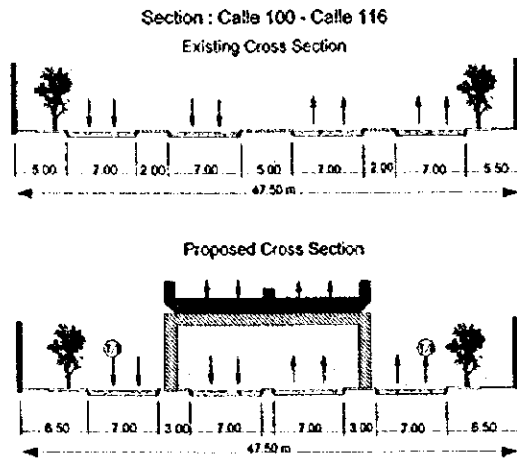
Typical Cross Section on Avenida 7a (2)
